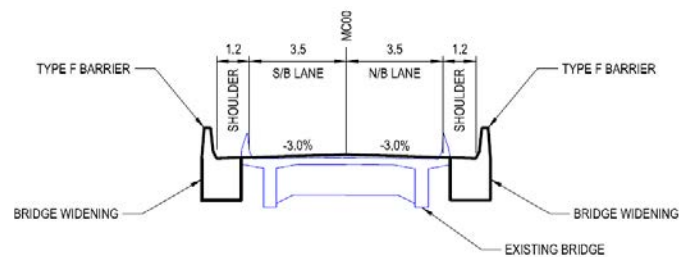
Cross sections of the Heathcote Road bridge with and without the proposed widening
